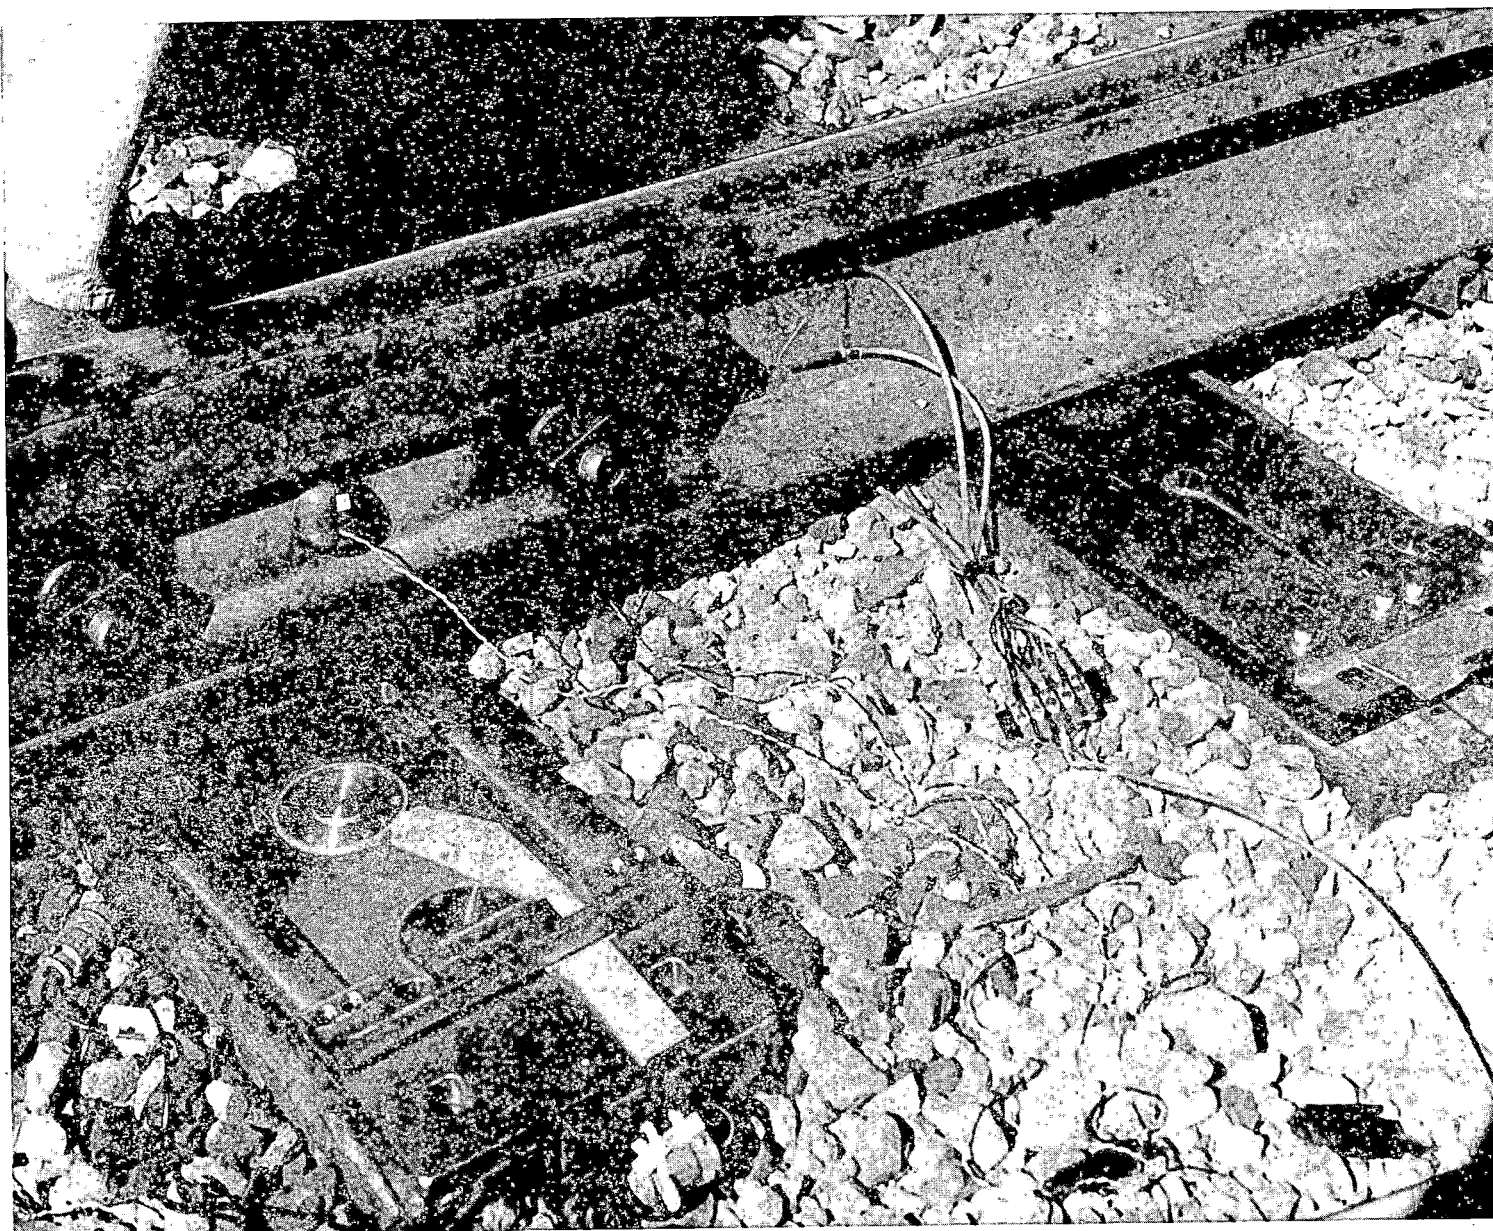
VIEW OF LOAD CELL TIE PLATES DURING INSTALLATION AT INSTRUMENTED RAIL JOINT
